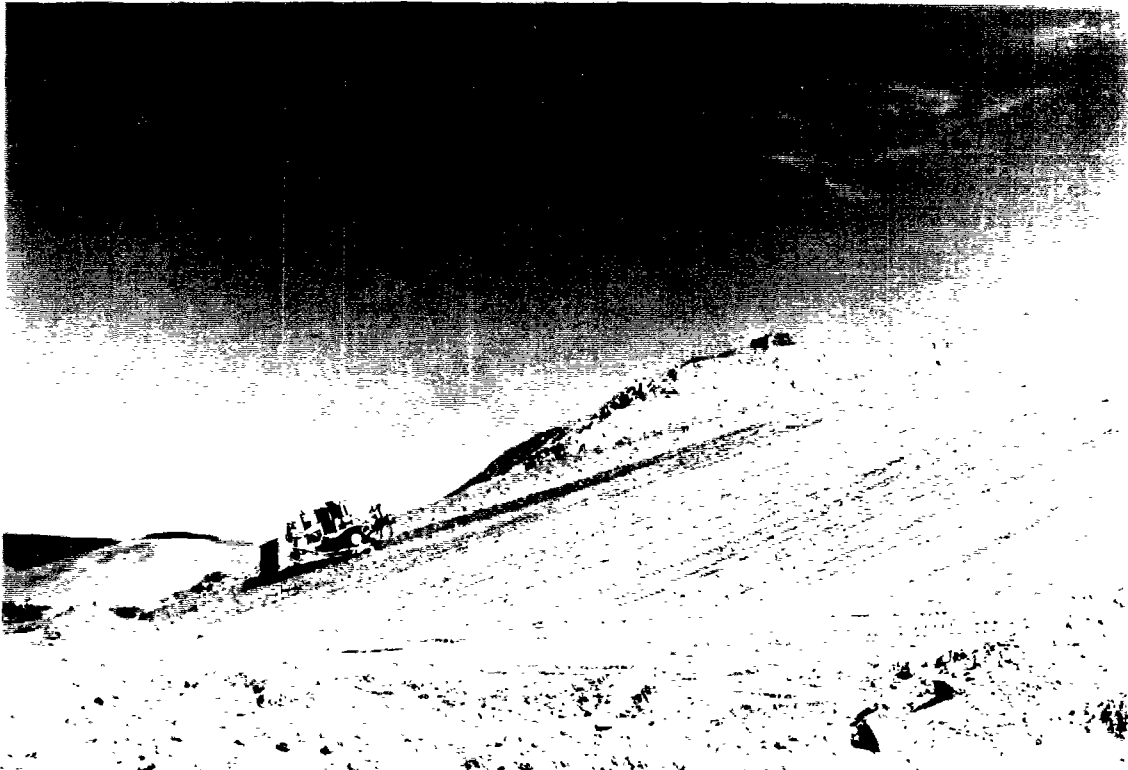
Dozers cutting 3:1 slope on JP-WO-04 in Southeast Jackpile area.
